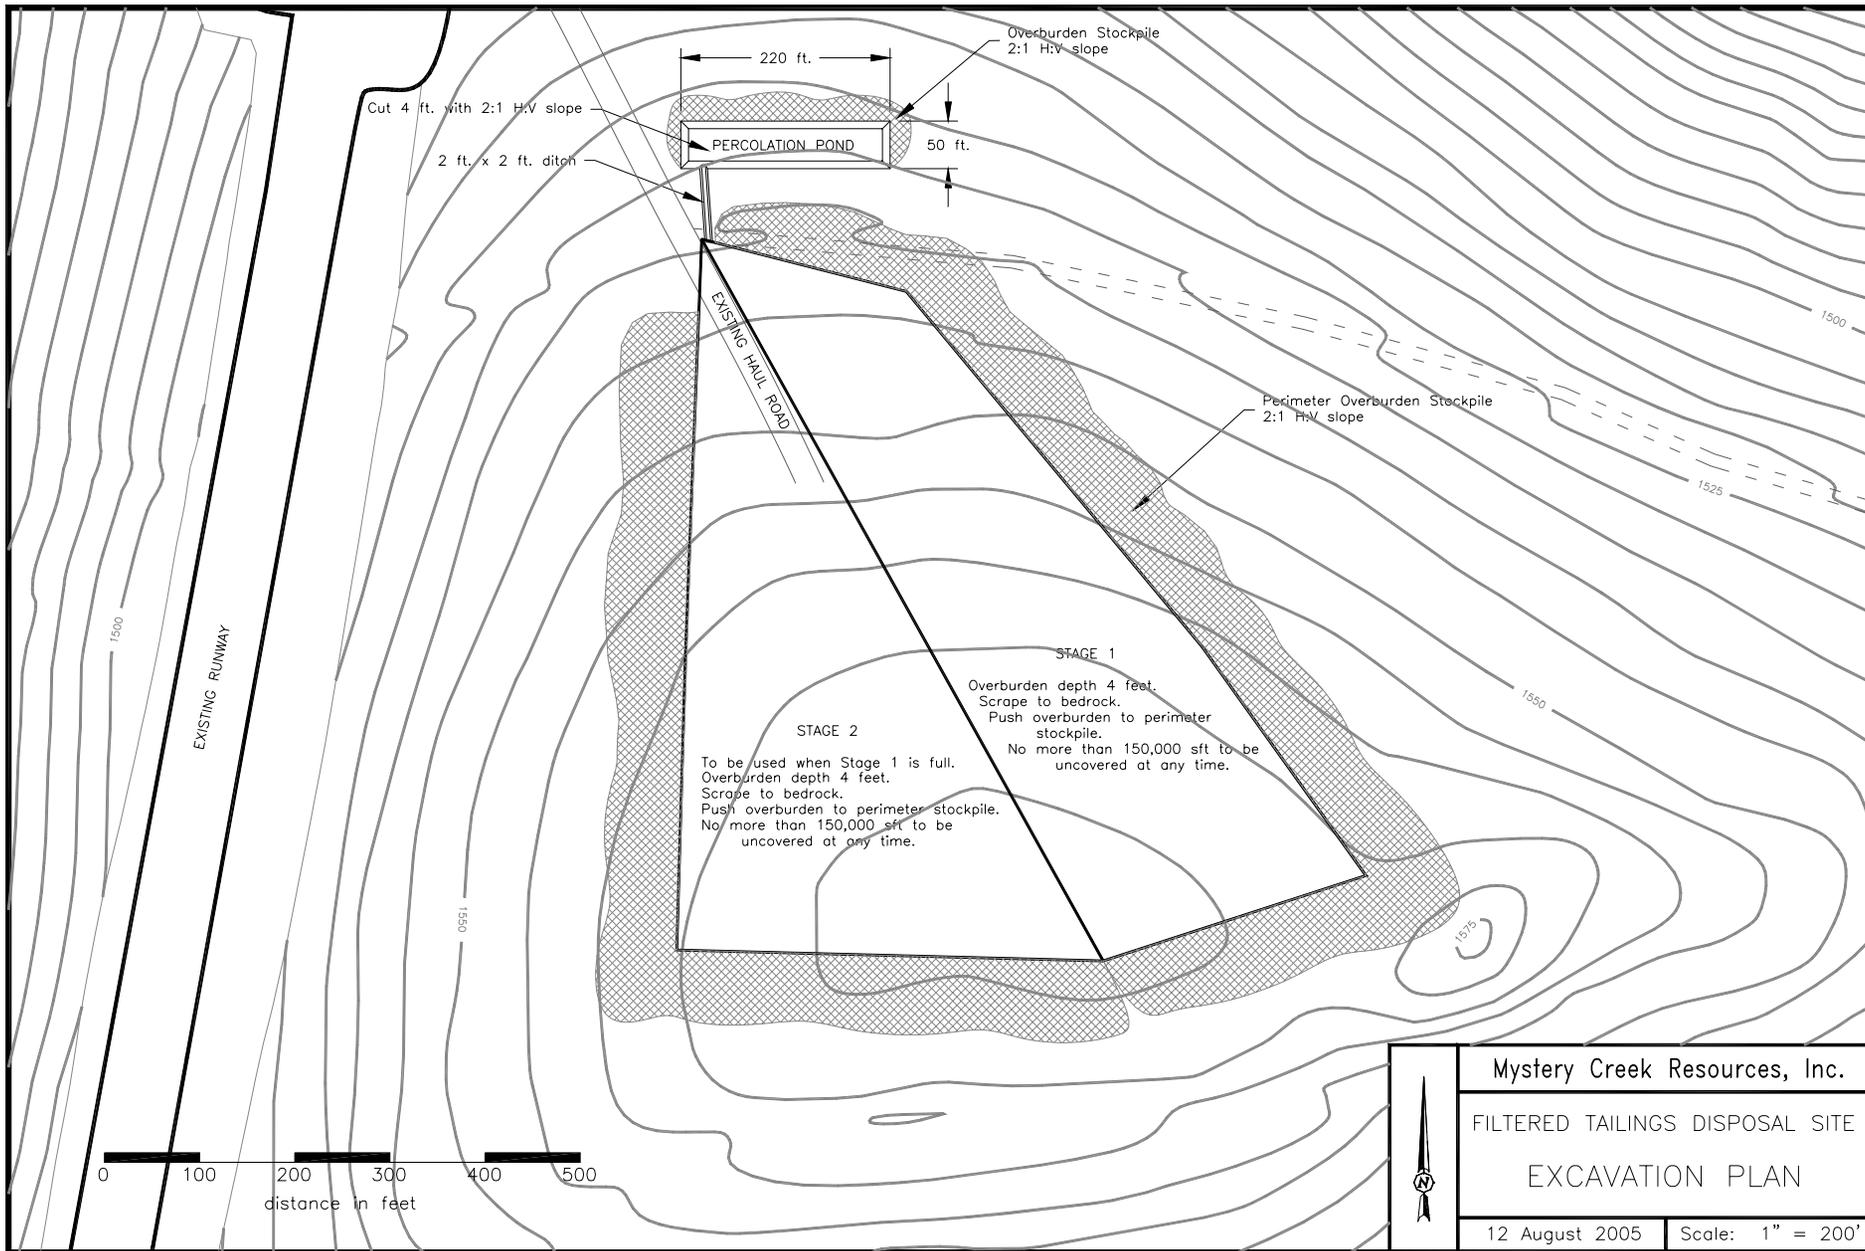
FILTERED TAILINGS DISPOSAL SITE EXCAVATION PLAN
